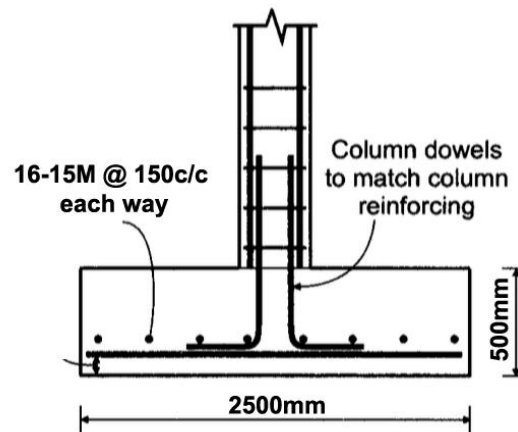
Foundation Reinforcement Drawing (N.T.S.)
